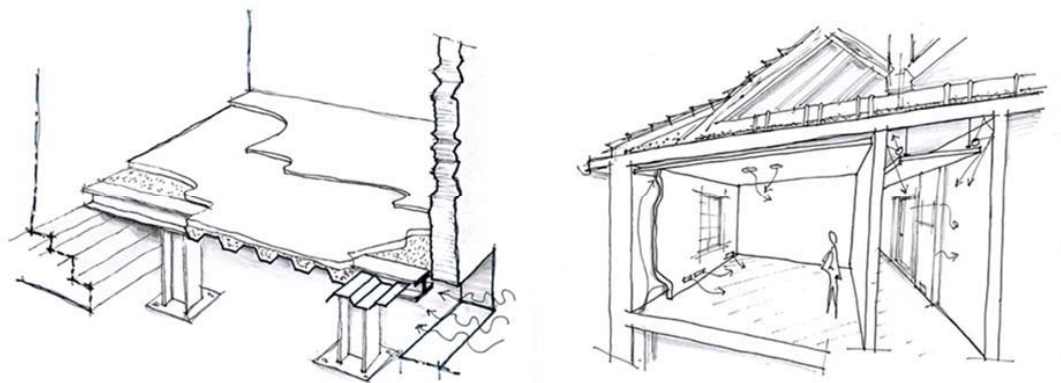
, 19 (from Left to Right): A new Ground Floor Slab will substitute the 1980s concrete structure creating the opportunity to solve Raising Dump phenomena through the reactivation of the original ventilation shaft; New false ceilings and walls will be installed to allow for a complete implants upgrade of the building minimizing demolitions
